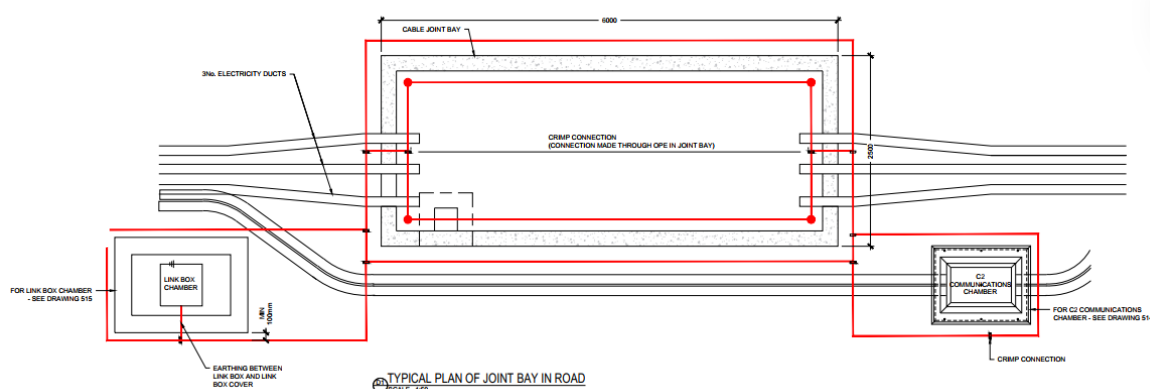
Joint Bay and Associated Chambers Arrangement (Plan View)
